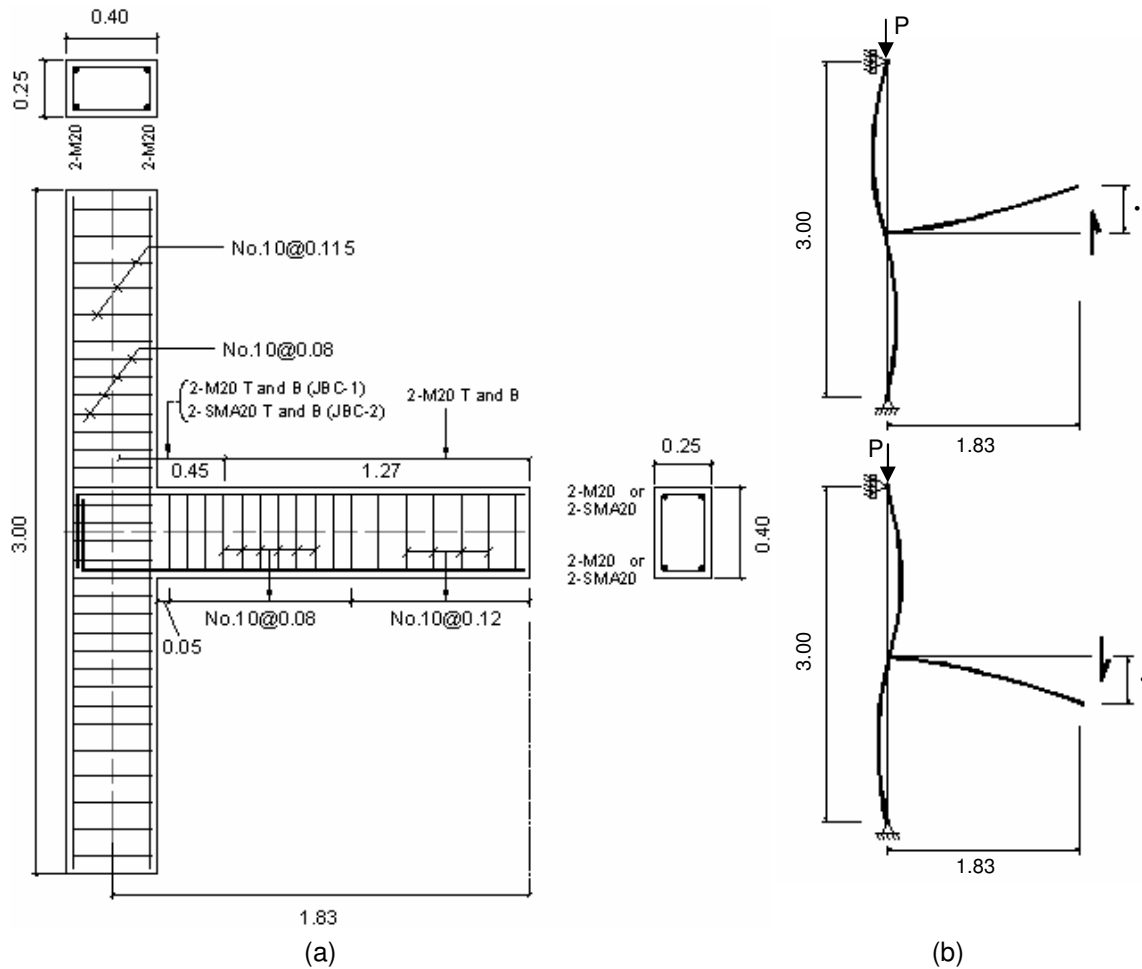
(a) Reinforcement details of specimen JBC-1 and JBC-2, (b) typical deflected shape of the specimens under reversed cycle of tip-displacement (dimensions in m).
